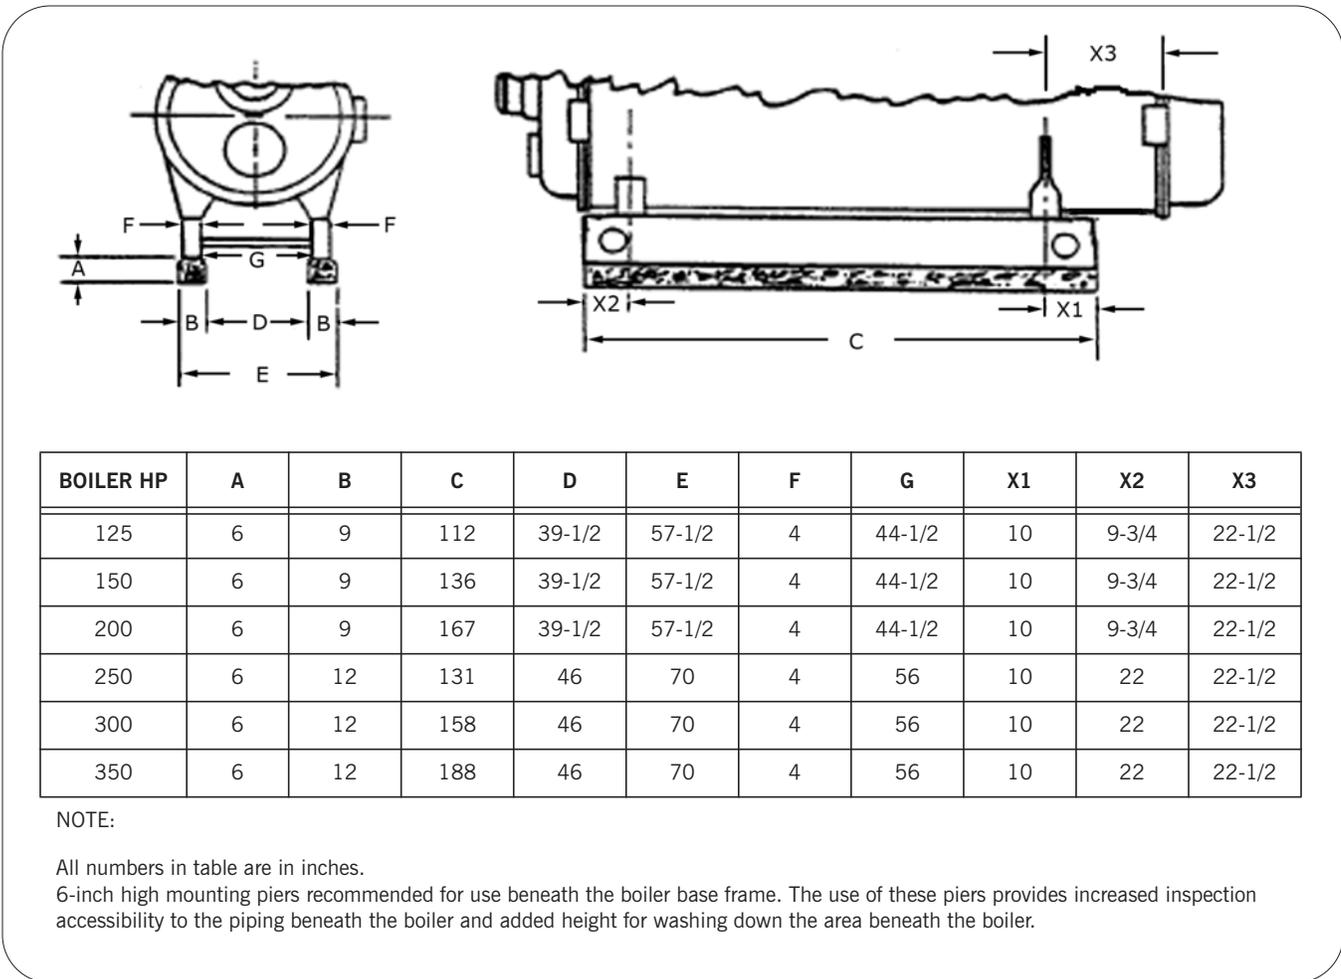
Model CB-LE Boiler Mounting Piers (60" and 78")
